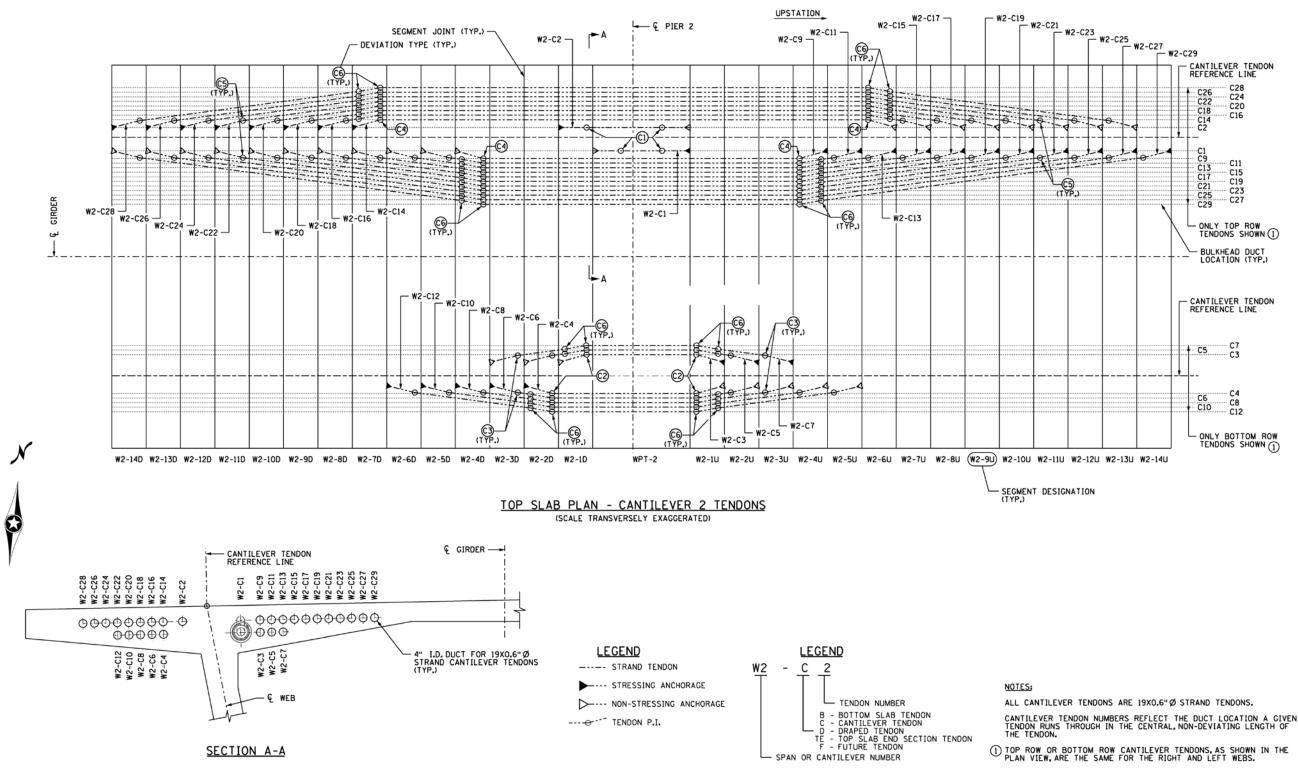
Westbound Cantilever 2 Cantilever Post-Tensioning Layout
